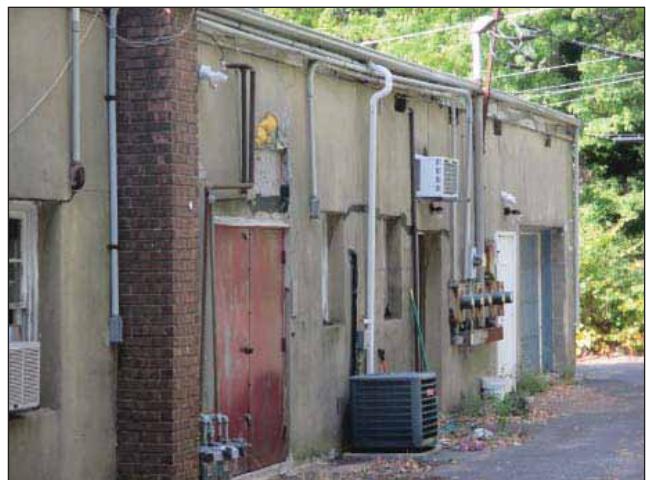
Rear of the building with HVAC unit in the drive aisle area.
